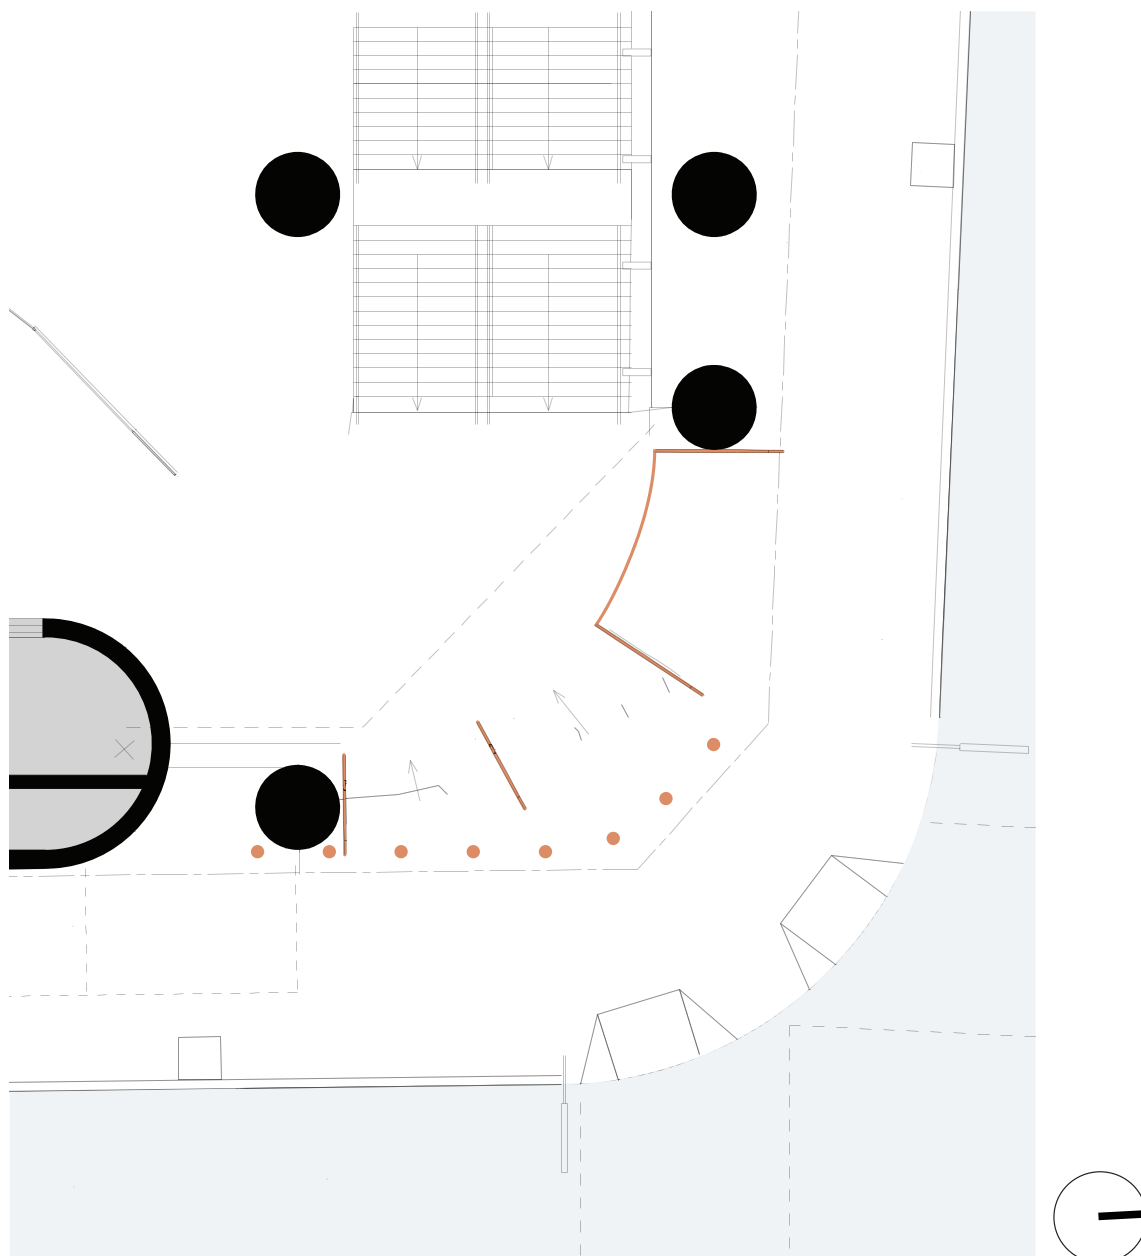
Plan — Stage 2 SSD DA Elizabeth Street Metro Entrance
